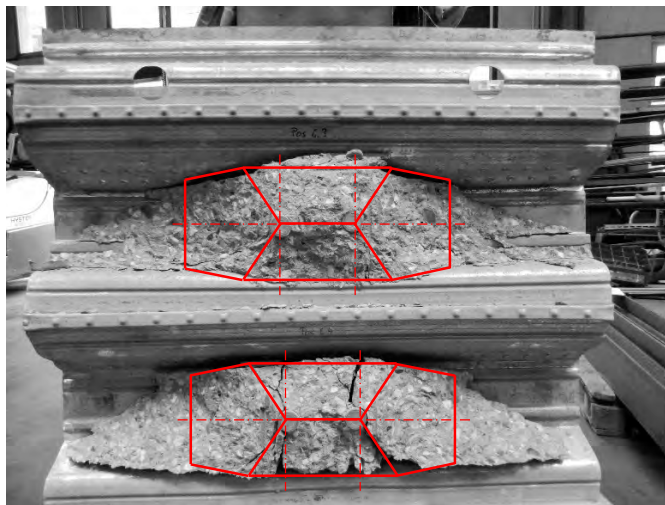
Observed failure cone in the concrete rib and idealised failure surface.
